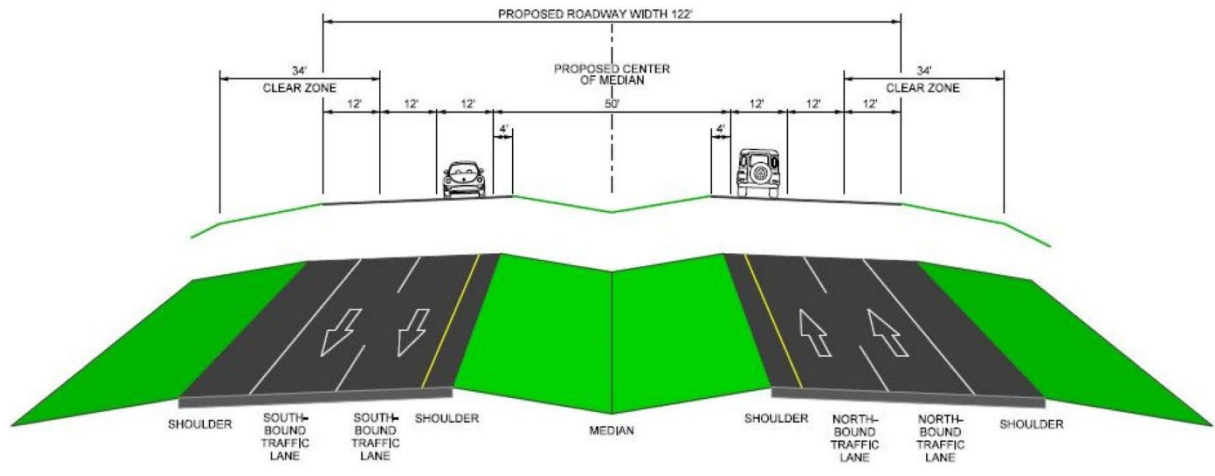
Level 2 Design Layout for West Bypass Parkway with Northern Extension and Realigned U.S. 189 (WB4)
